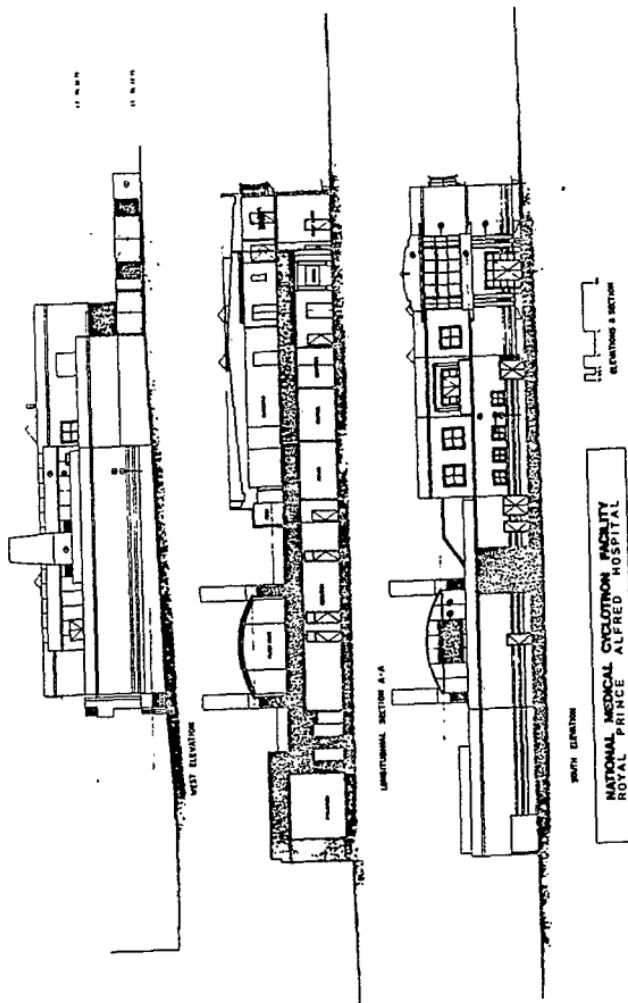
ELEVATIONS AND SECTION - SOUTH AND WEST
